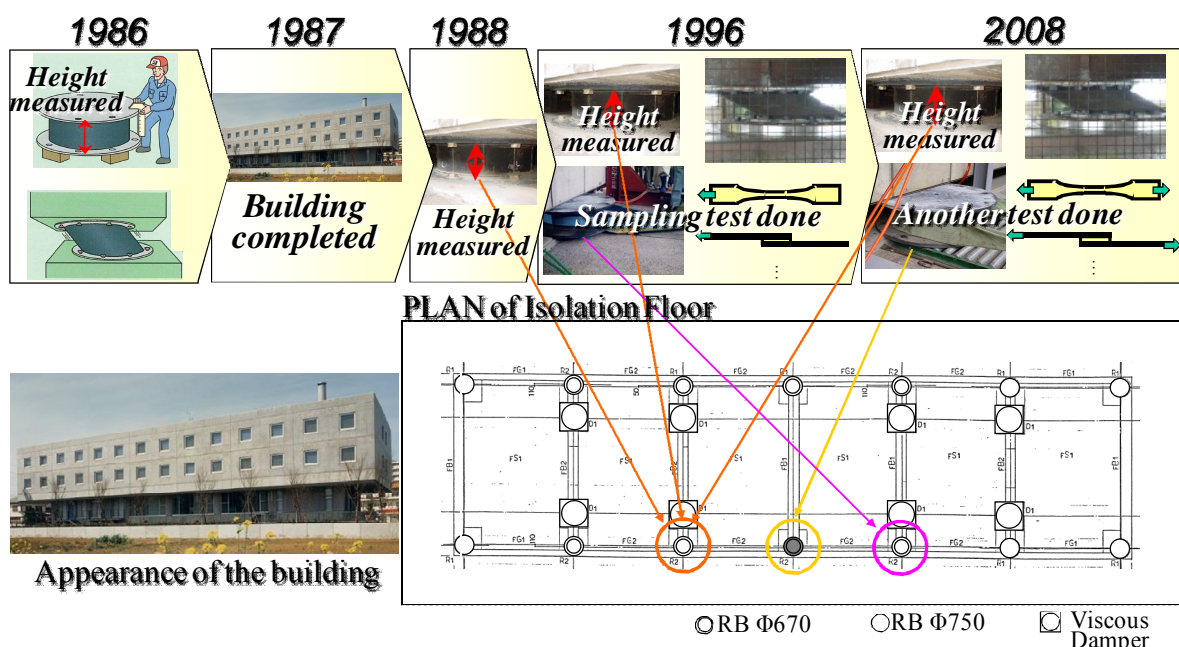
What We Did for Actually Used Rubber Bearings in a SI Building
